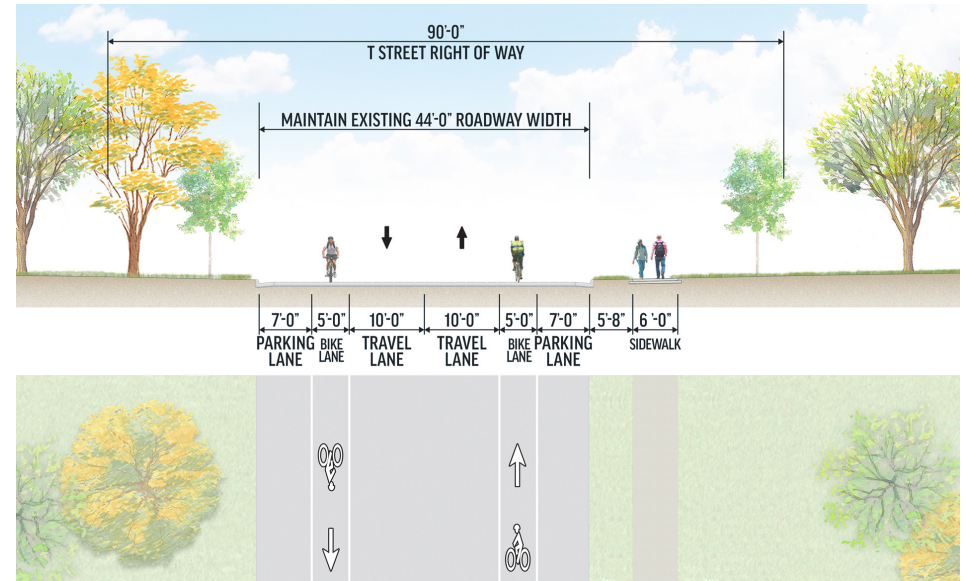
Typical streetscape section of conventional bike lanes along T Street NE that connect Bladensburg Road NE to 24th Street NE.
